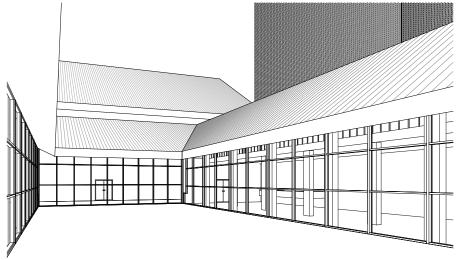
Glass facades surrounding courtyard with tower and tea room on background, Image by author 2022
